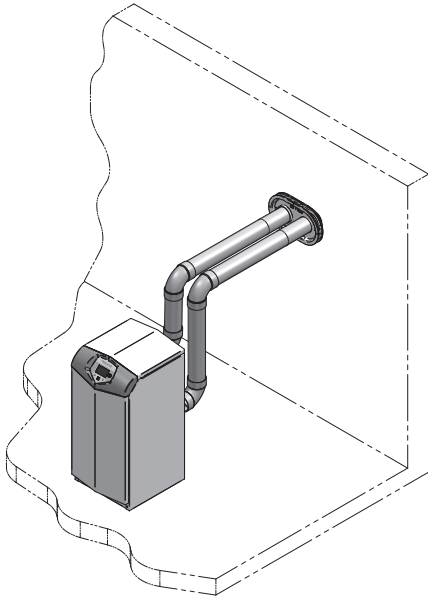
Two-Pipe Sidewall Termination - See page 24 for more details
